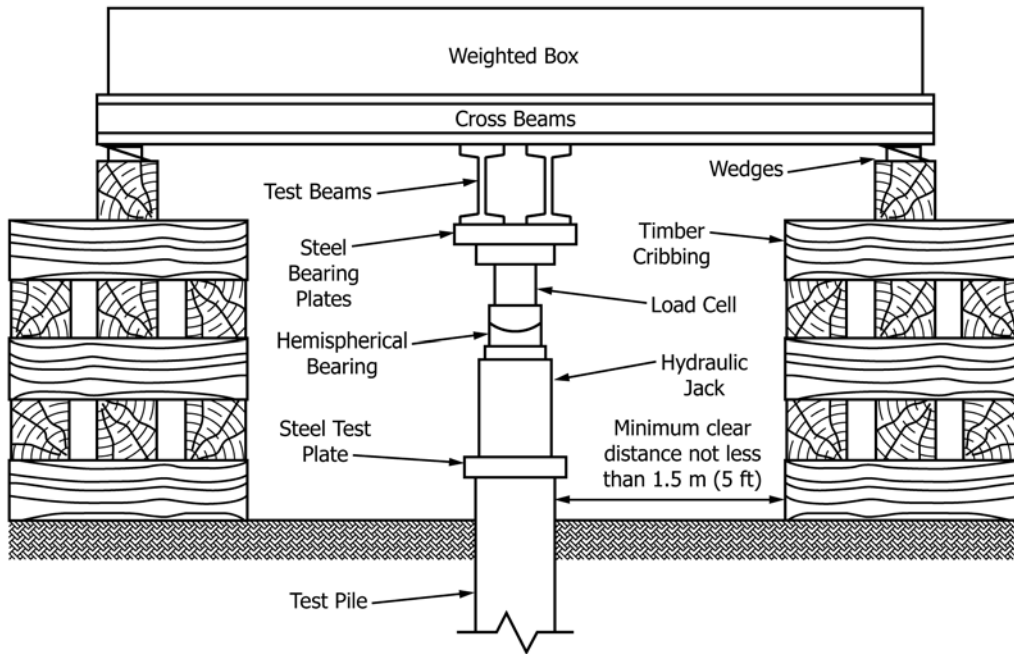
Schematic Hydraulic Jack on an Element Acting against a Weighted Box or Platform
